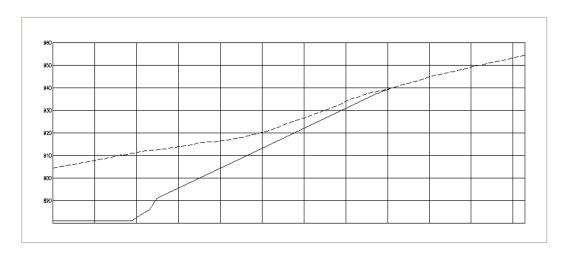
Longitudinal Section 02 at tunnel inlet embankment and initial excavation design
